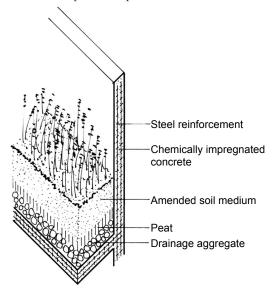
Chemically impregnated concrete roof garden (Boughouse, 2003)
